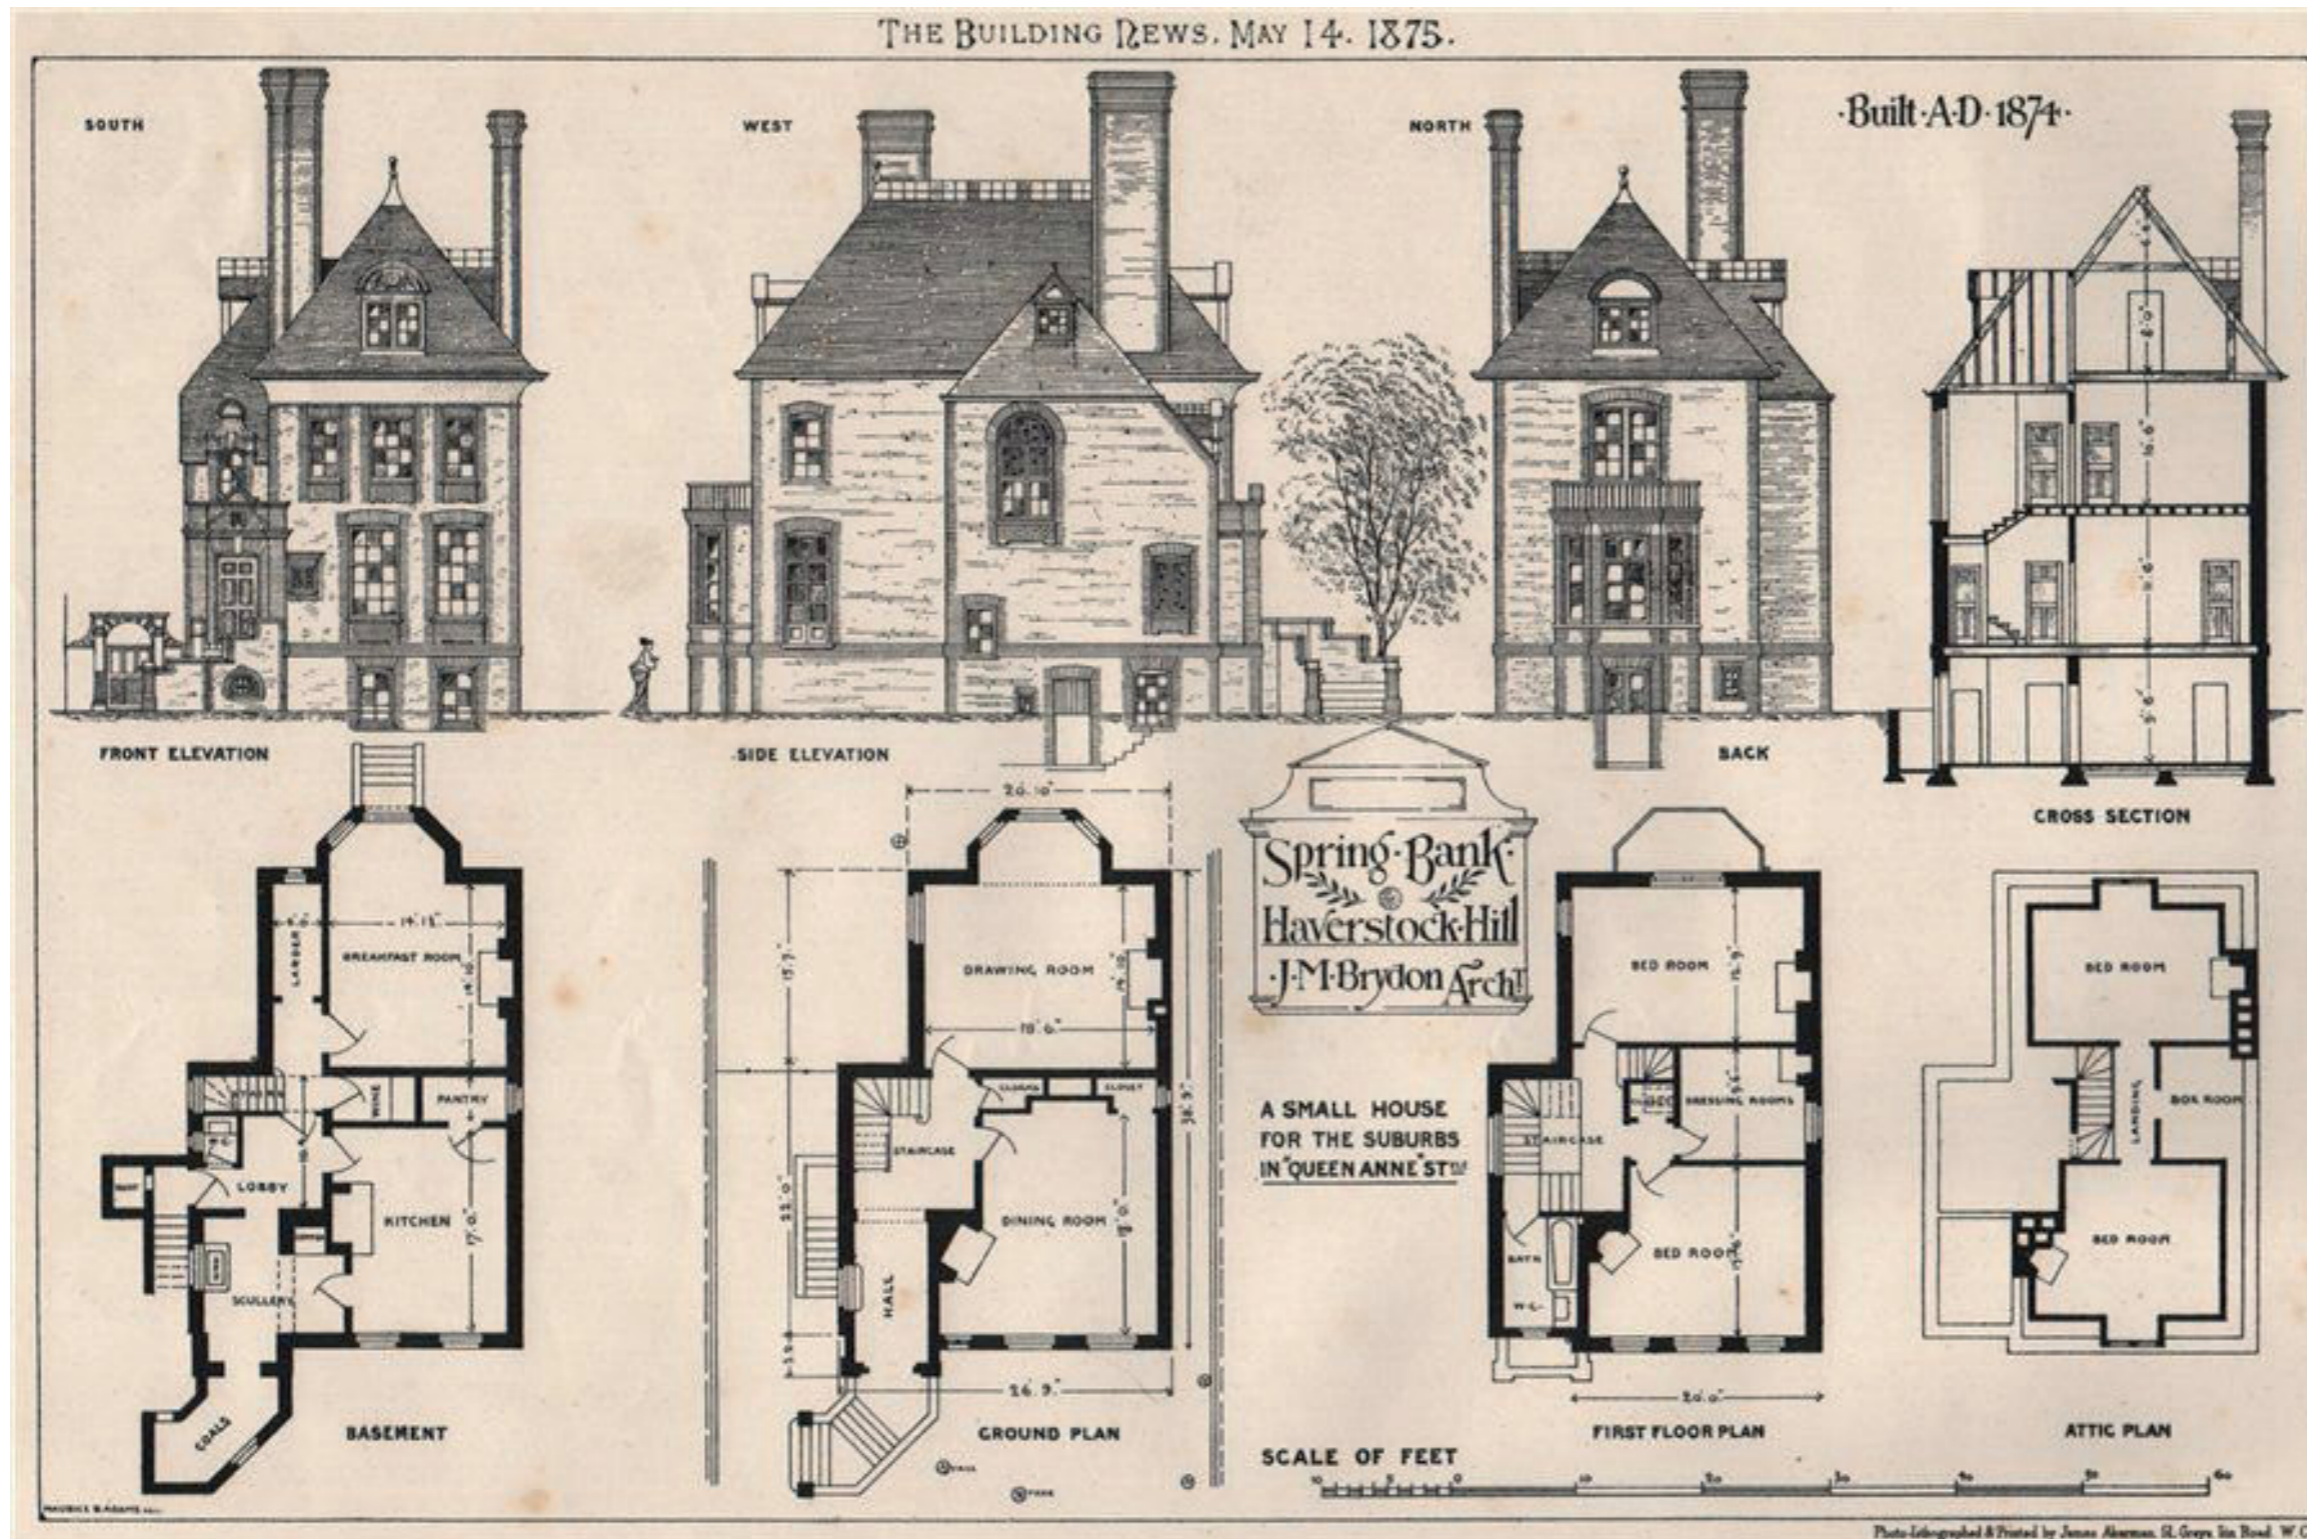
Exterior elevations and plan form, The Building News (1875)
